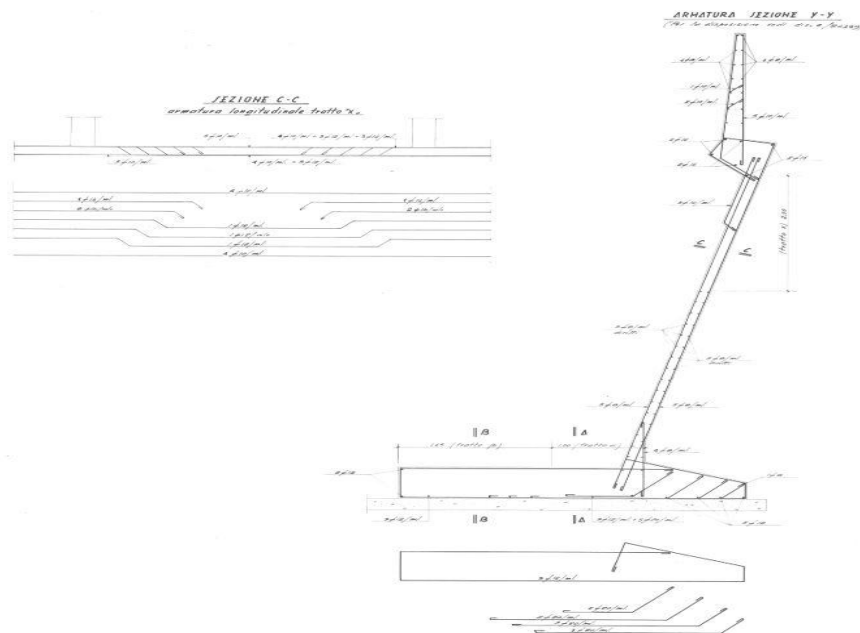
Disposition of the reinforcement of retaining wall from the original drawings in Morandi's documents (Bonadè Bottino & Morandi, 1959)
